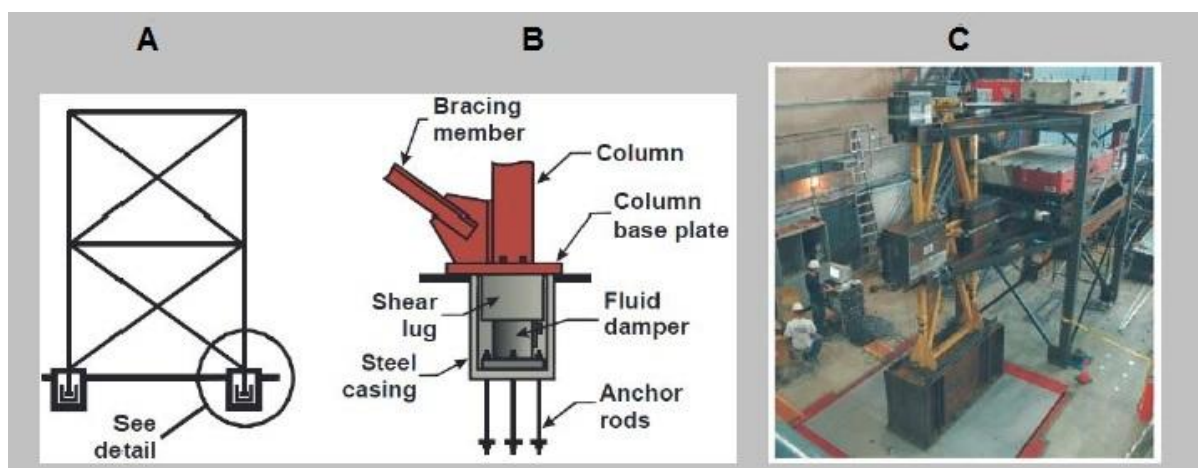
Application of fluid viscous dampers in rocking steel structures: (A) Damper placement in the structure, (B) Damper details, (C) Laboratory specimen preparation (Shukla, 1999)
